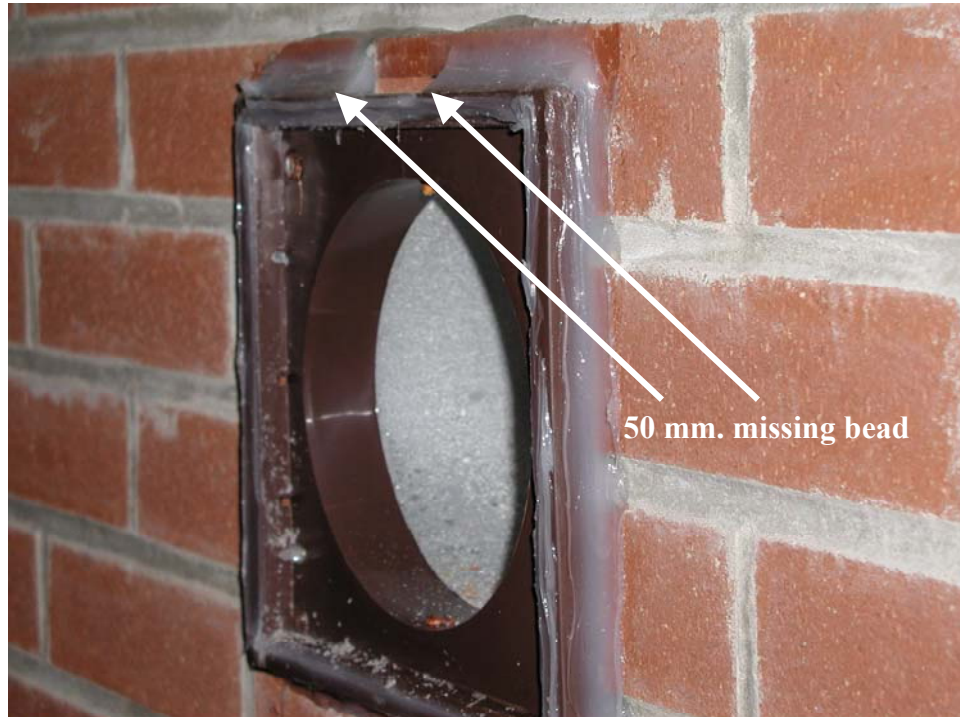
Example of a typical deficiency around the ventilation duct in a masonry-clad wall specimen
